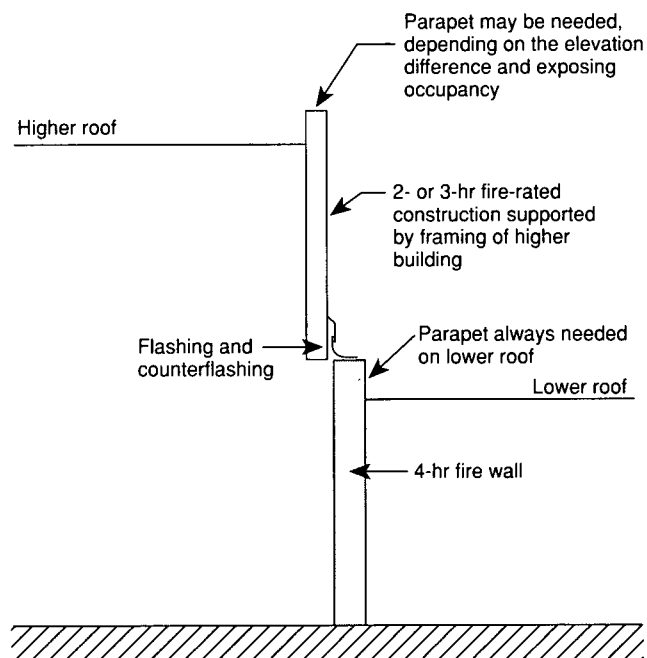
(b) Fire wall arrangement at elevation difference (cantilever wall).
